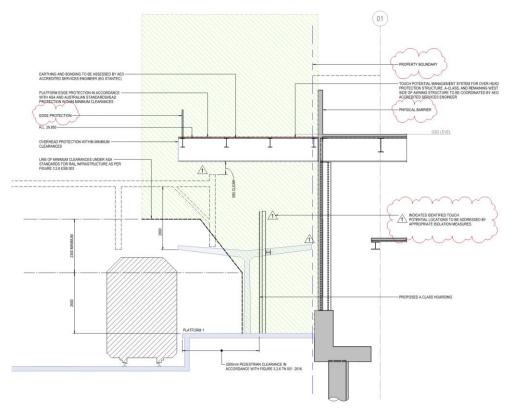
TTW drawing extract demonstrating compliance with ASA requirements
